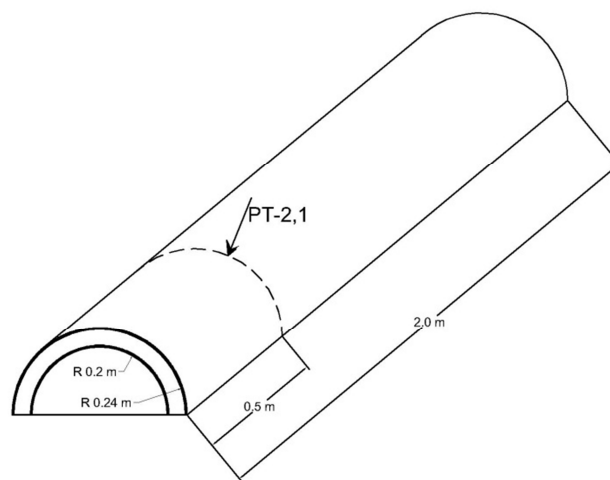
Schematic model for Semi-cylindrical single wall subject to Point Load at various loading point.
